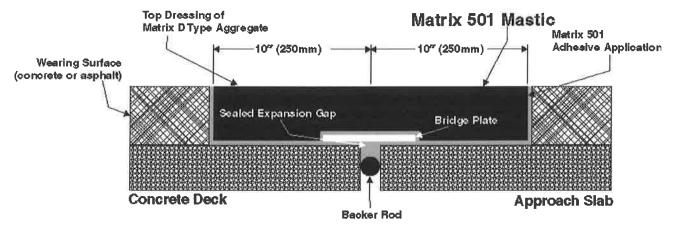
Typical Matrix 501 Asphaltic Plug Bridge Joint System Installation
